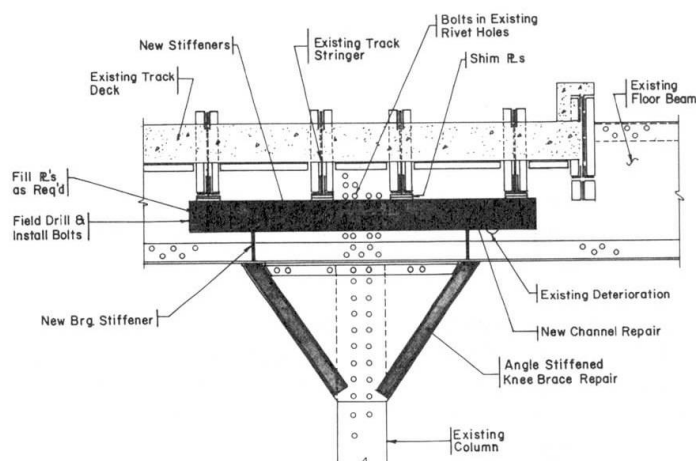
Alternate load path repair utilizing a channel and stiffened knee brace plate
